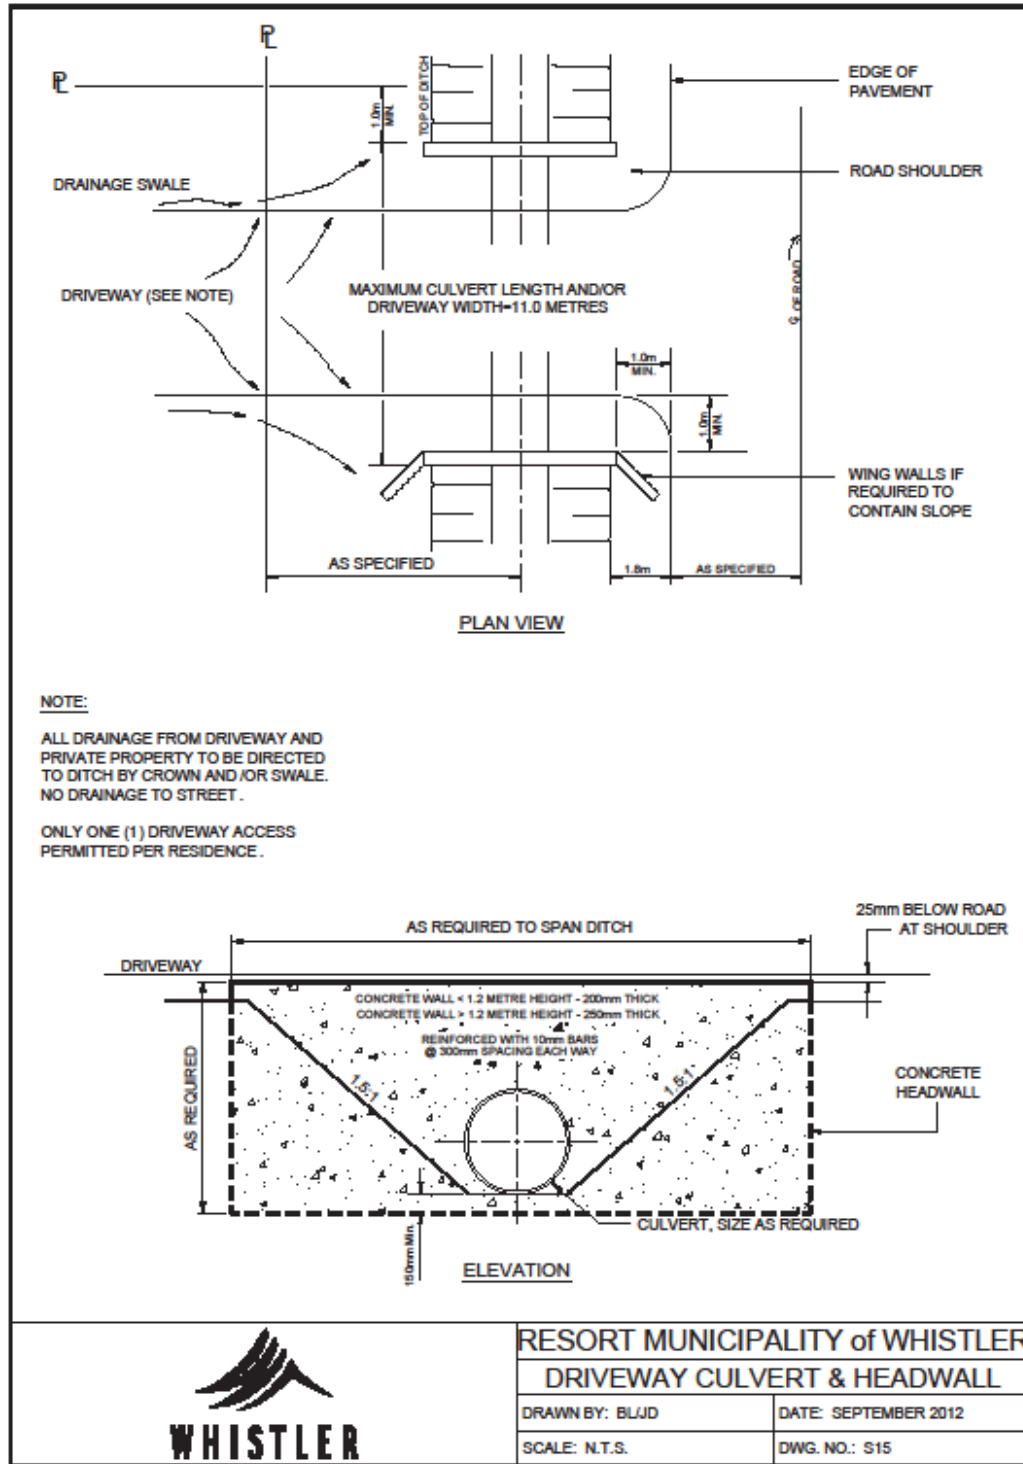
Driveway Culvert and Headwall Standard Drawing
